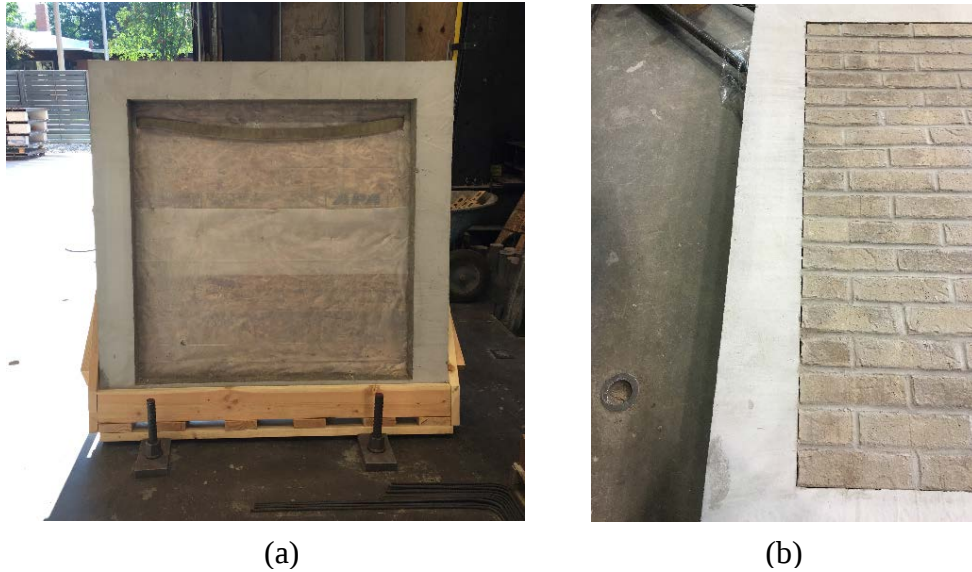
(a) Concrete frame for masonry infill wall and (b) separation between concrete frame and masonry panel
